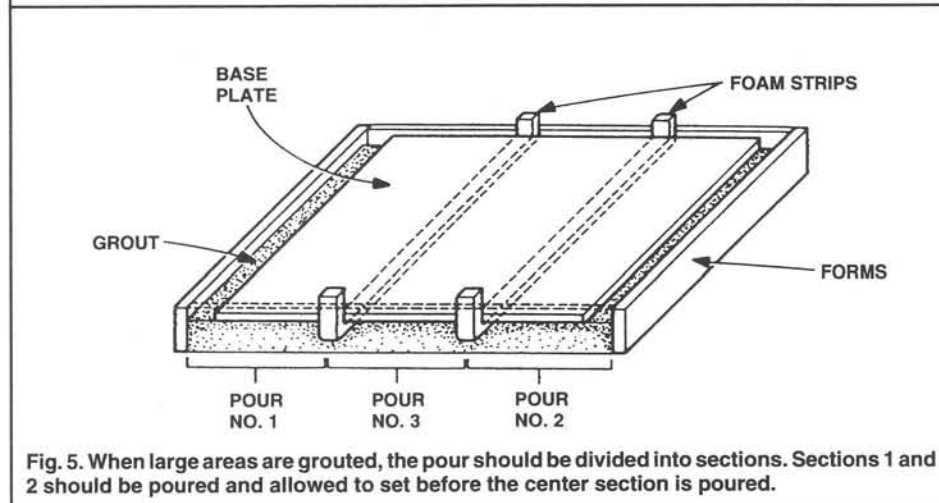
When large areas are grouted, the pour should be divided into sections. Sections 1 and 2 should be poured and allowed to set before the center section is poured.
